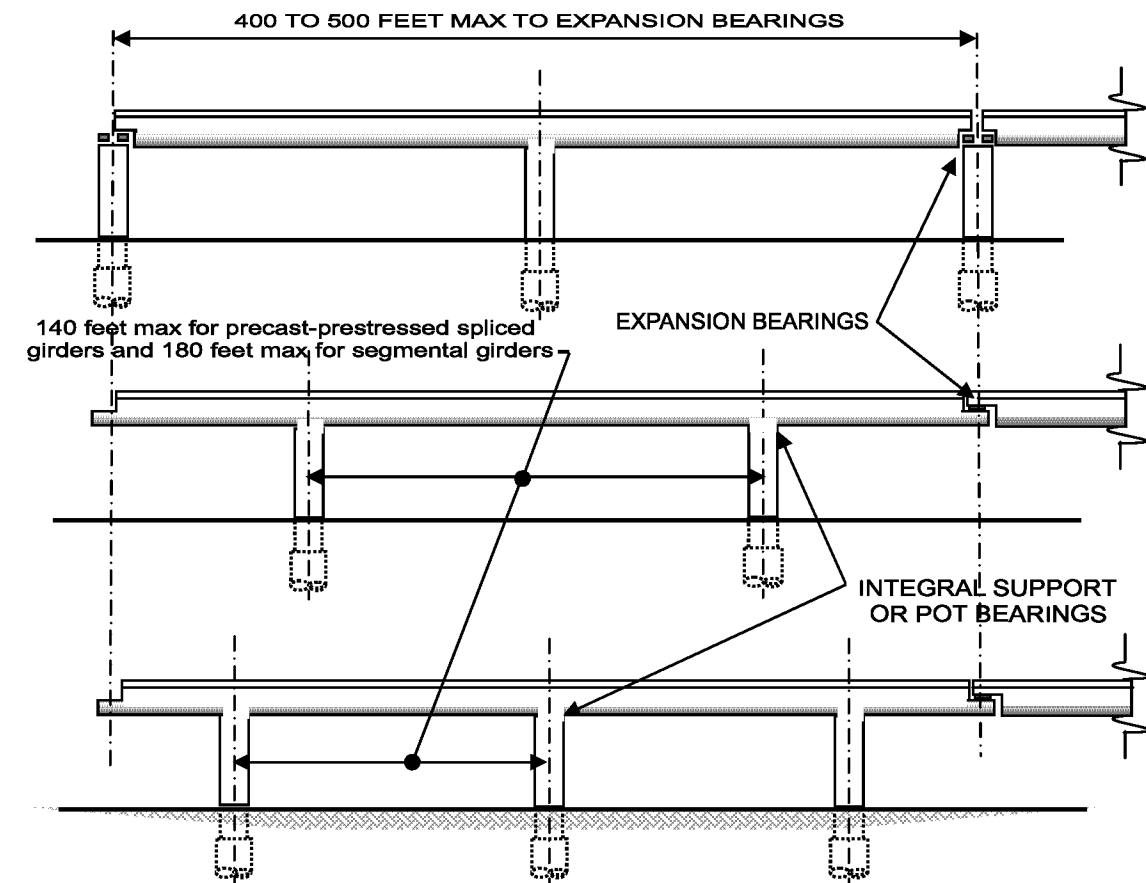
Precast Segmental and Precast Spliced Girder Plans
